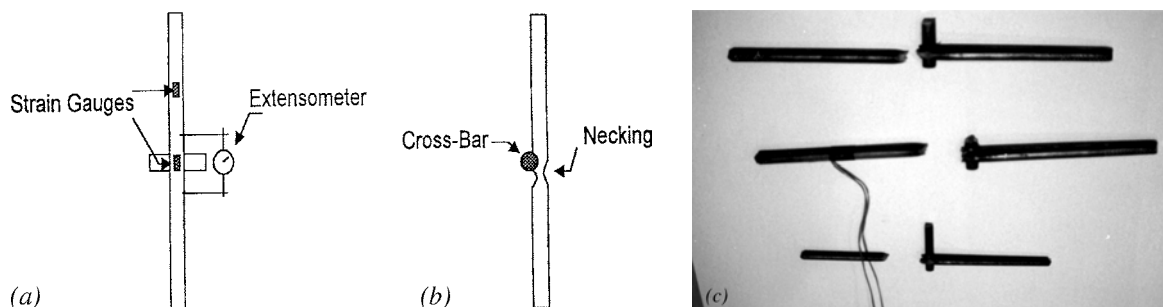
Grid coupons and rupturing of welded reinforcement: (a) instrumentation of typical coupon; (b) location of "necking;" and (c) typical coupon failures.
